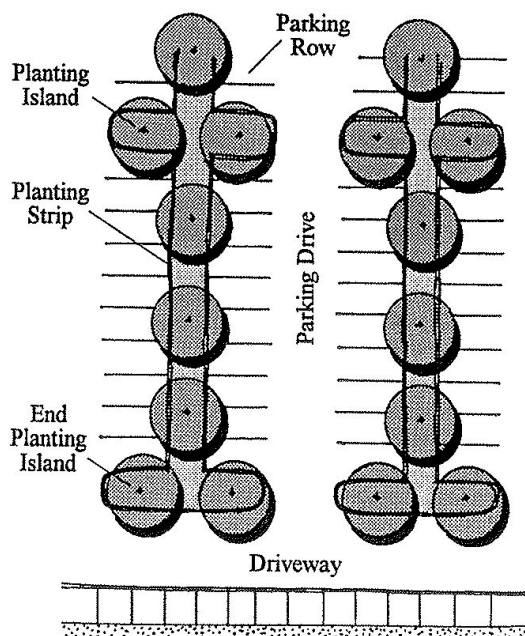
Parking lots should feature landscaped planting islands and planting strips as shown above.
